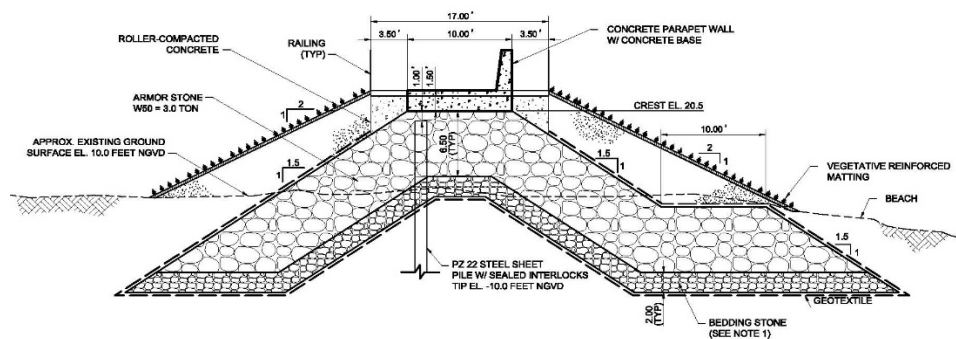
Concrete Parapet Wall atop Buried Seawall
